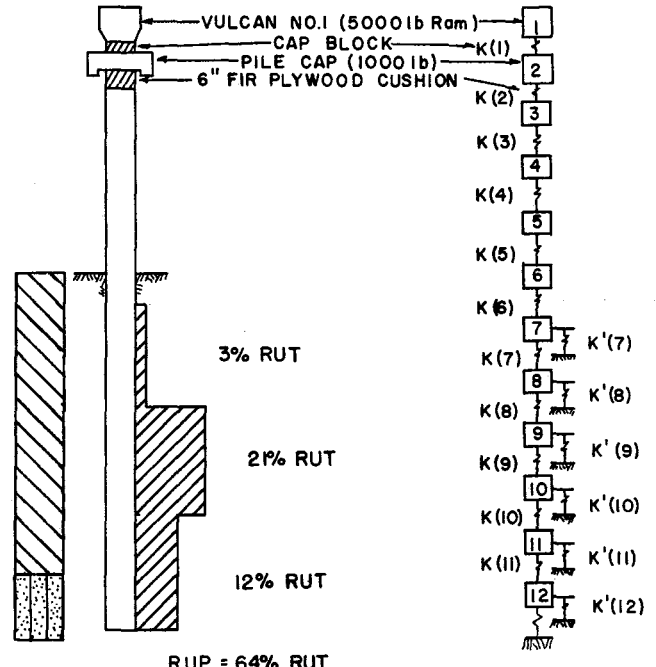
Pile load distribution for Chocolate Bayou Bridge, 60-foot pile.
